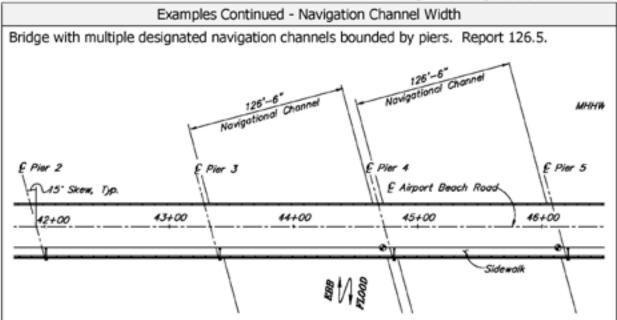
Bridge plan view indicating navigation channel width dimensions. (Source: Alaska DOT)
